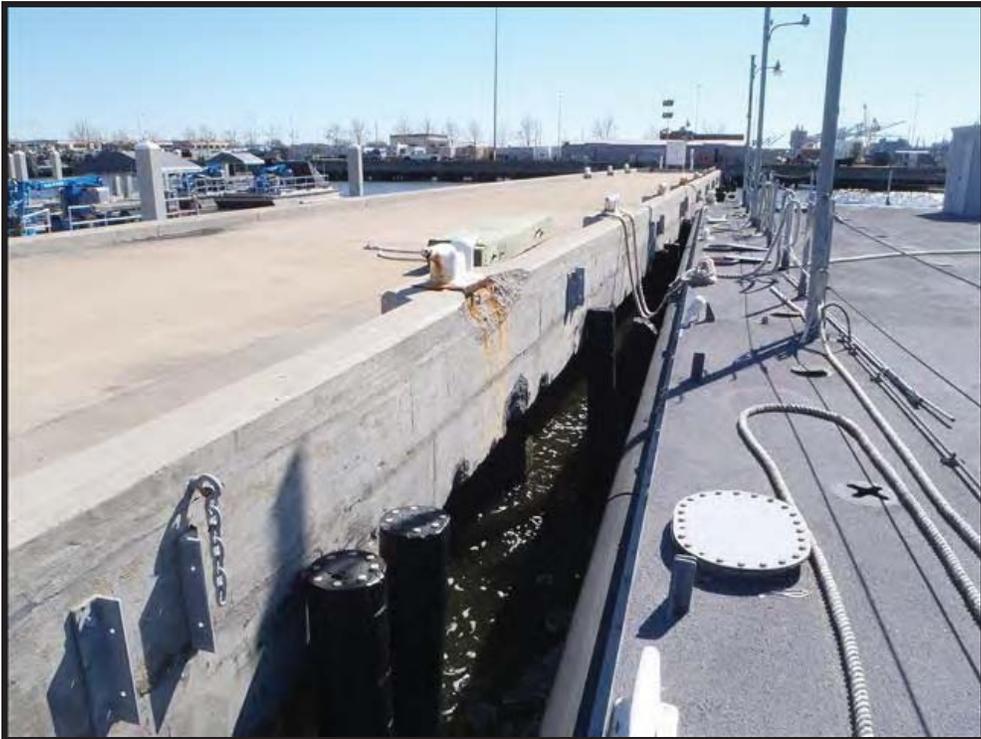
Overview of CEP169 Breakwater near Sta. 0+00, looking southeast.
